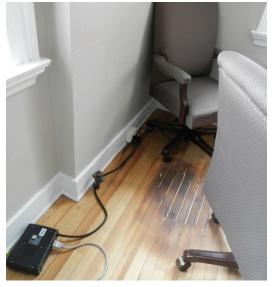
Wood floor damage, 2020 (source: Ratio)
